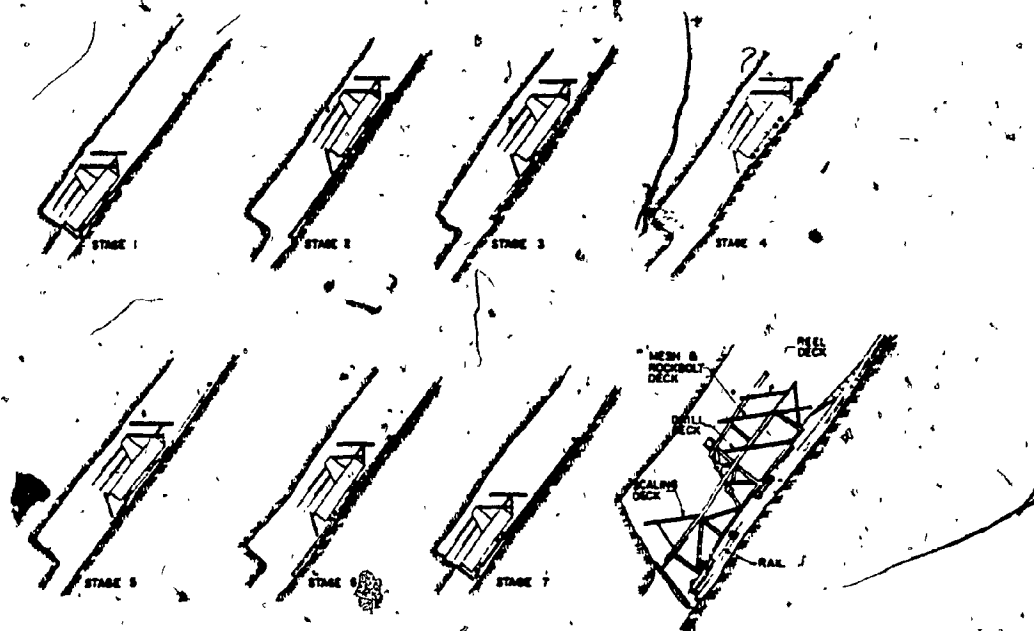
Penstock excavation sequences - Stages 1 to 7
